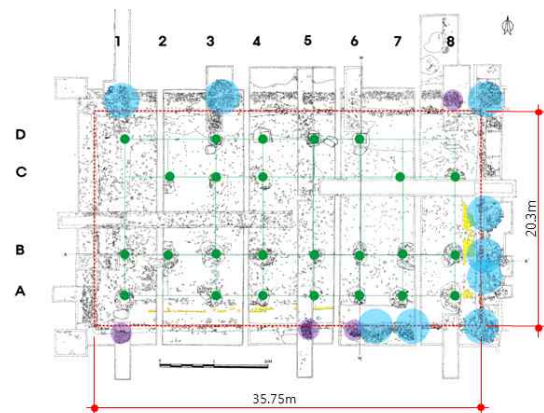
Excavation plan of west hall in Hwangnyongsa temple site(Report 1984, coloring and edit)
